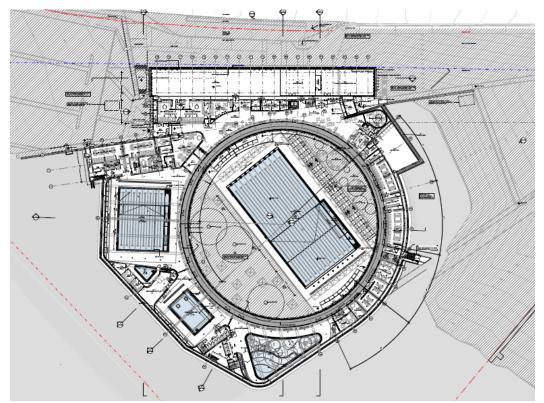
Ground Plan (Source: Grimshaw ABA, November 2020)
